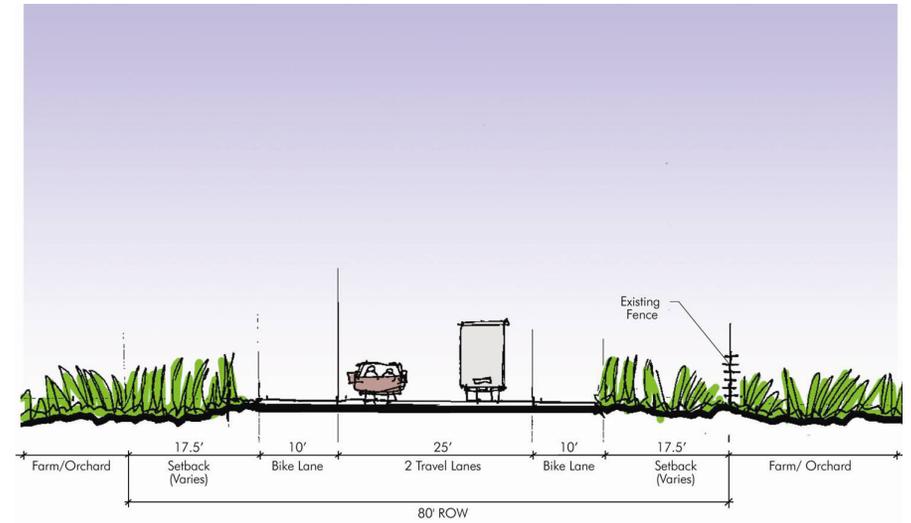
CROSS SECTION OF EXISTING CORRIDOR (COUNTY ROAD)
